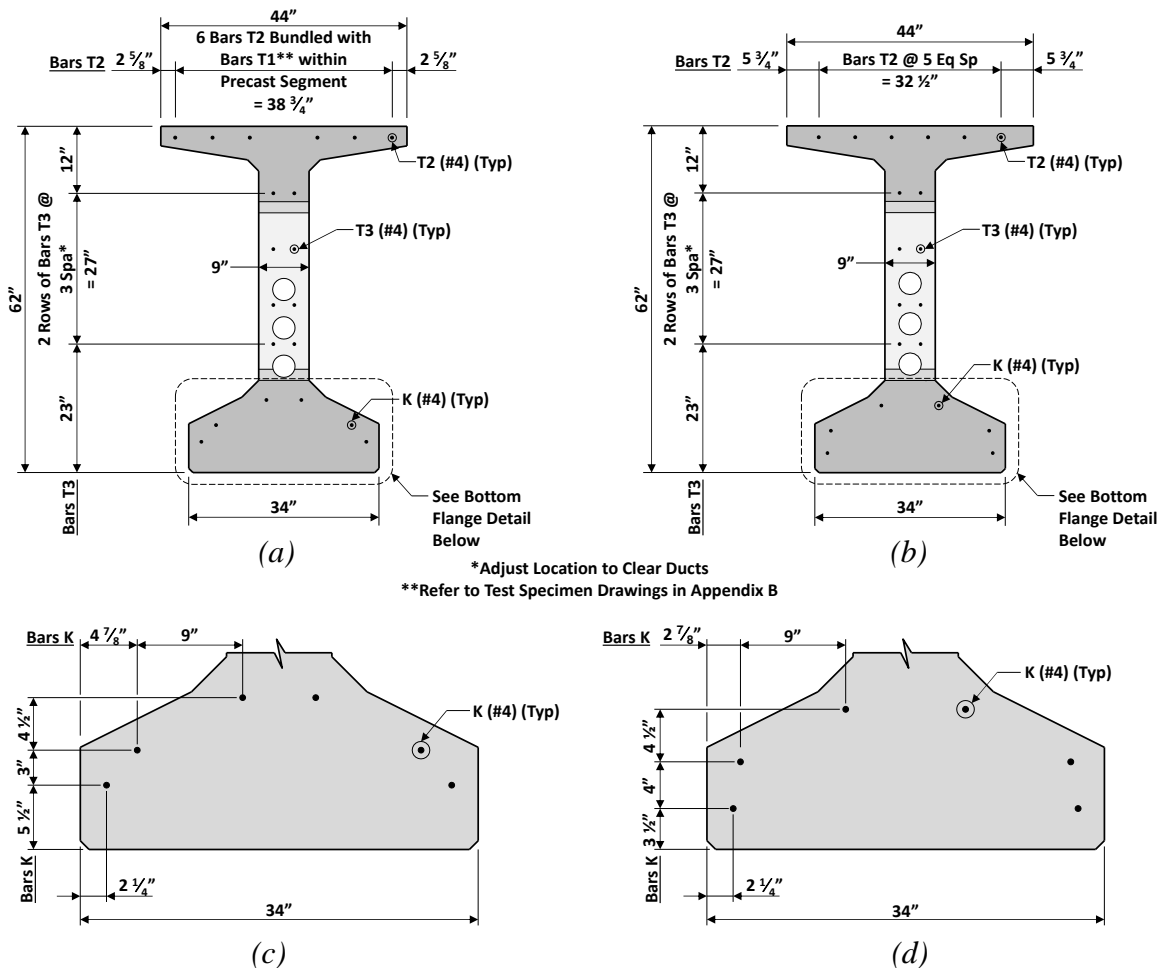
Longitudinal interface reinforcement of Test Girder 1 – (a) end of long precast segment; (b) end of short precast segment; (c) flange detail of long precast segment; (d) flange detail of short precast segment
